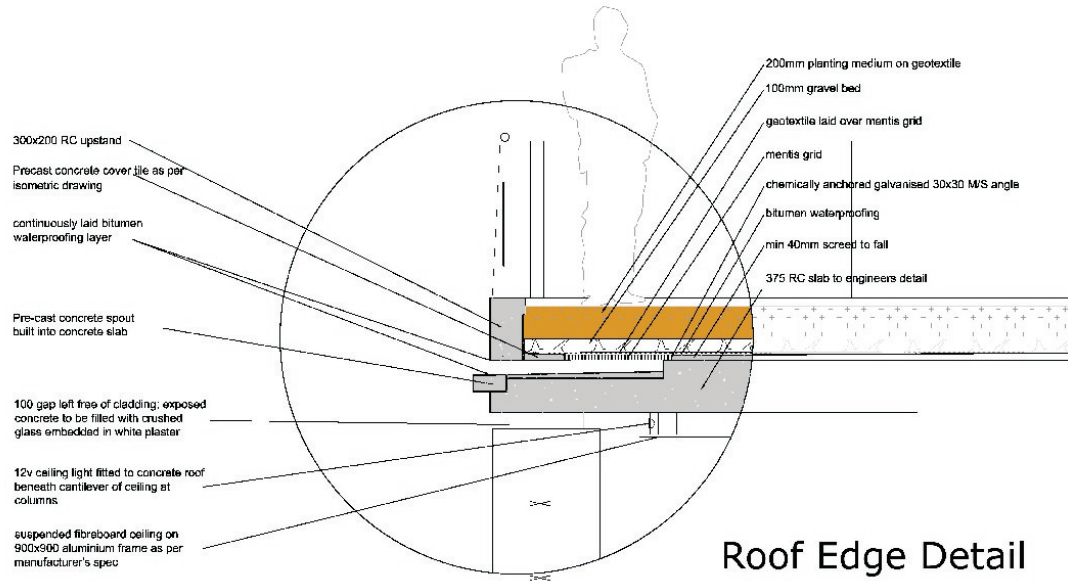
Details of a planted roof at Moore House in Sharon, Connecticut
